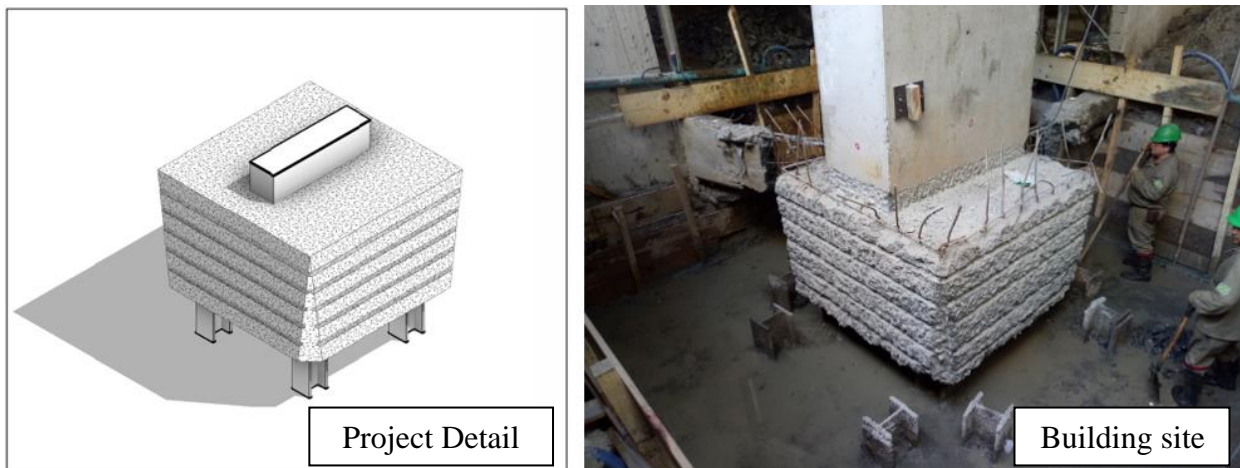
Detail of the surface treatment of pile cap. Detail of the project (left) and the situation “building site” (right).
